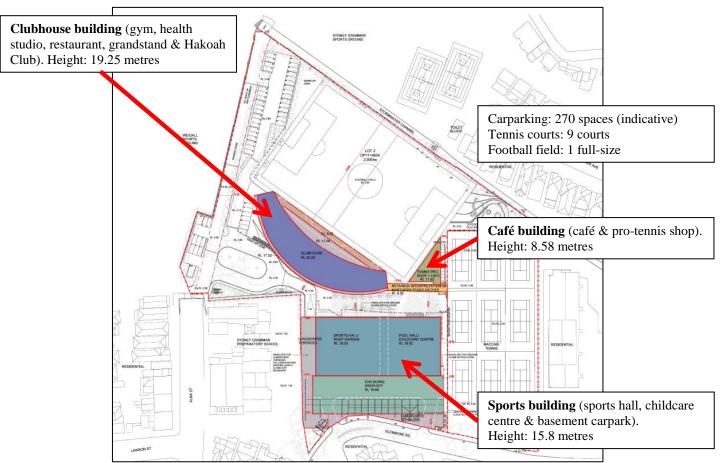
Proposed Site Plan showing building envelopes and indicative uses
